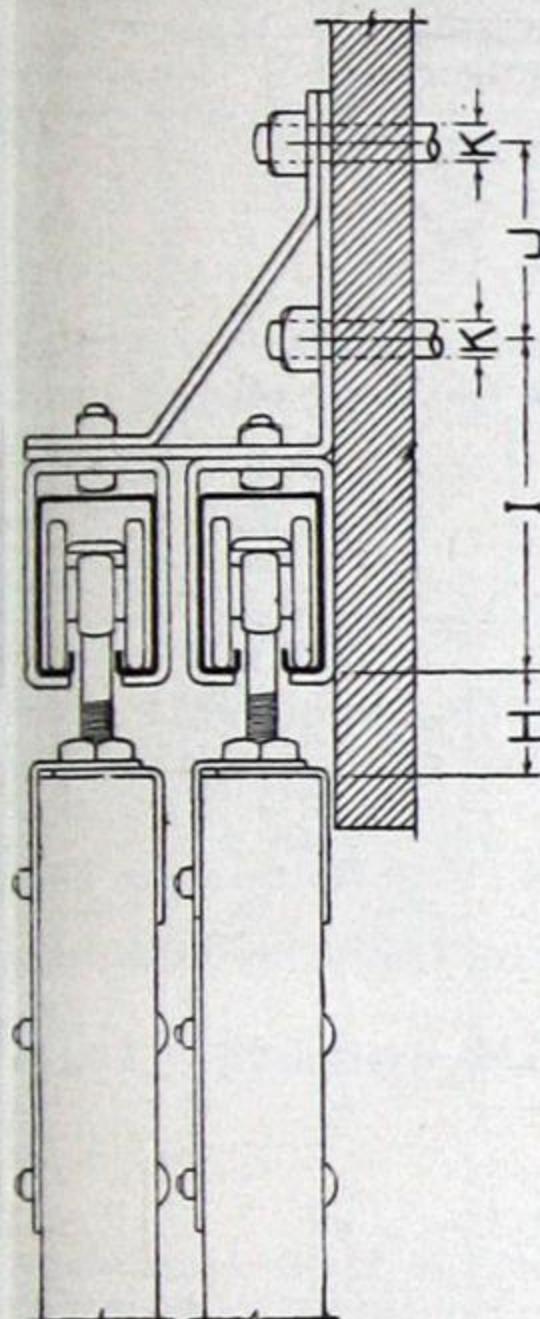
Cross-section showing overhead bracket attachment, with weatherstrip, of two parallel sliding doors. See page 96 for dimensions.
